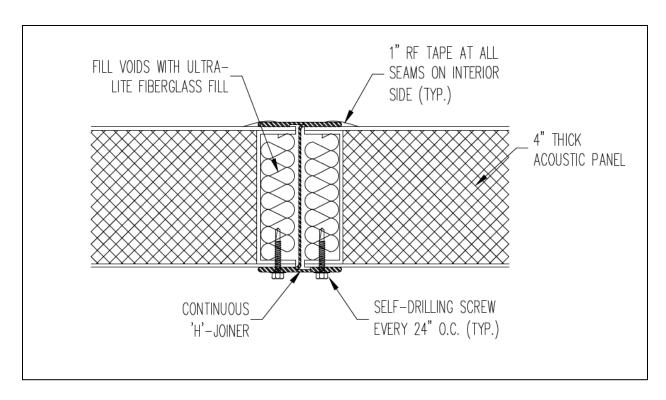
Fabrication details: typical wall panel joint (plan view). (Adapted from Noise Barriers, LLC, 2011.)
